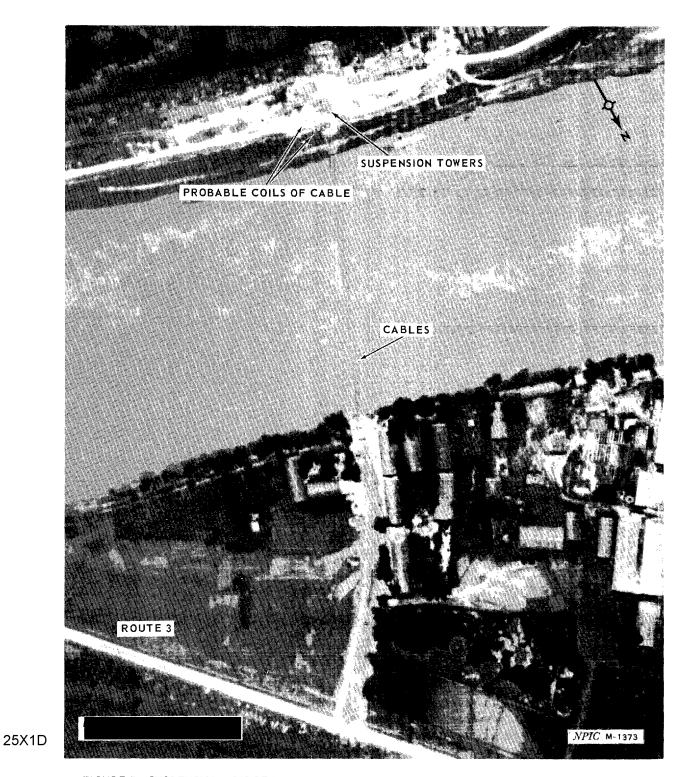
SUSPENSION BRIDGE UNDER CONSTRUCTION OVER THE SONG DUONG, HA NOI AREA, NORTH VIETNAM
